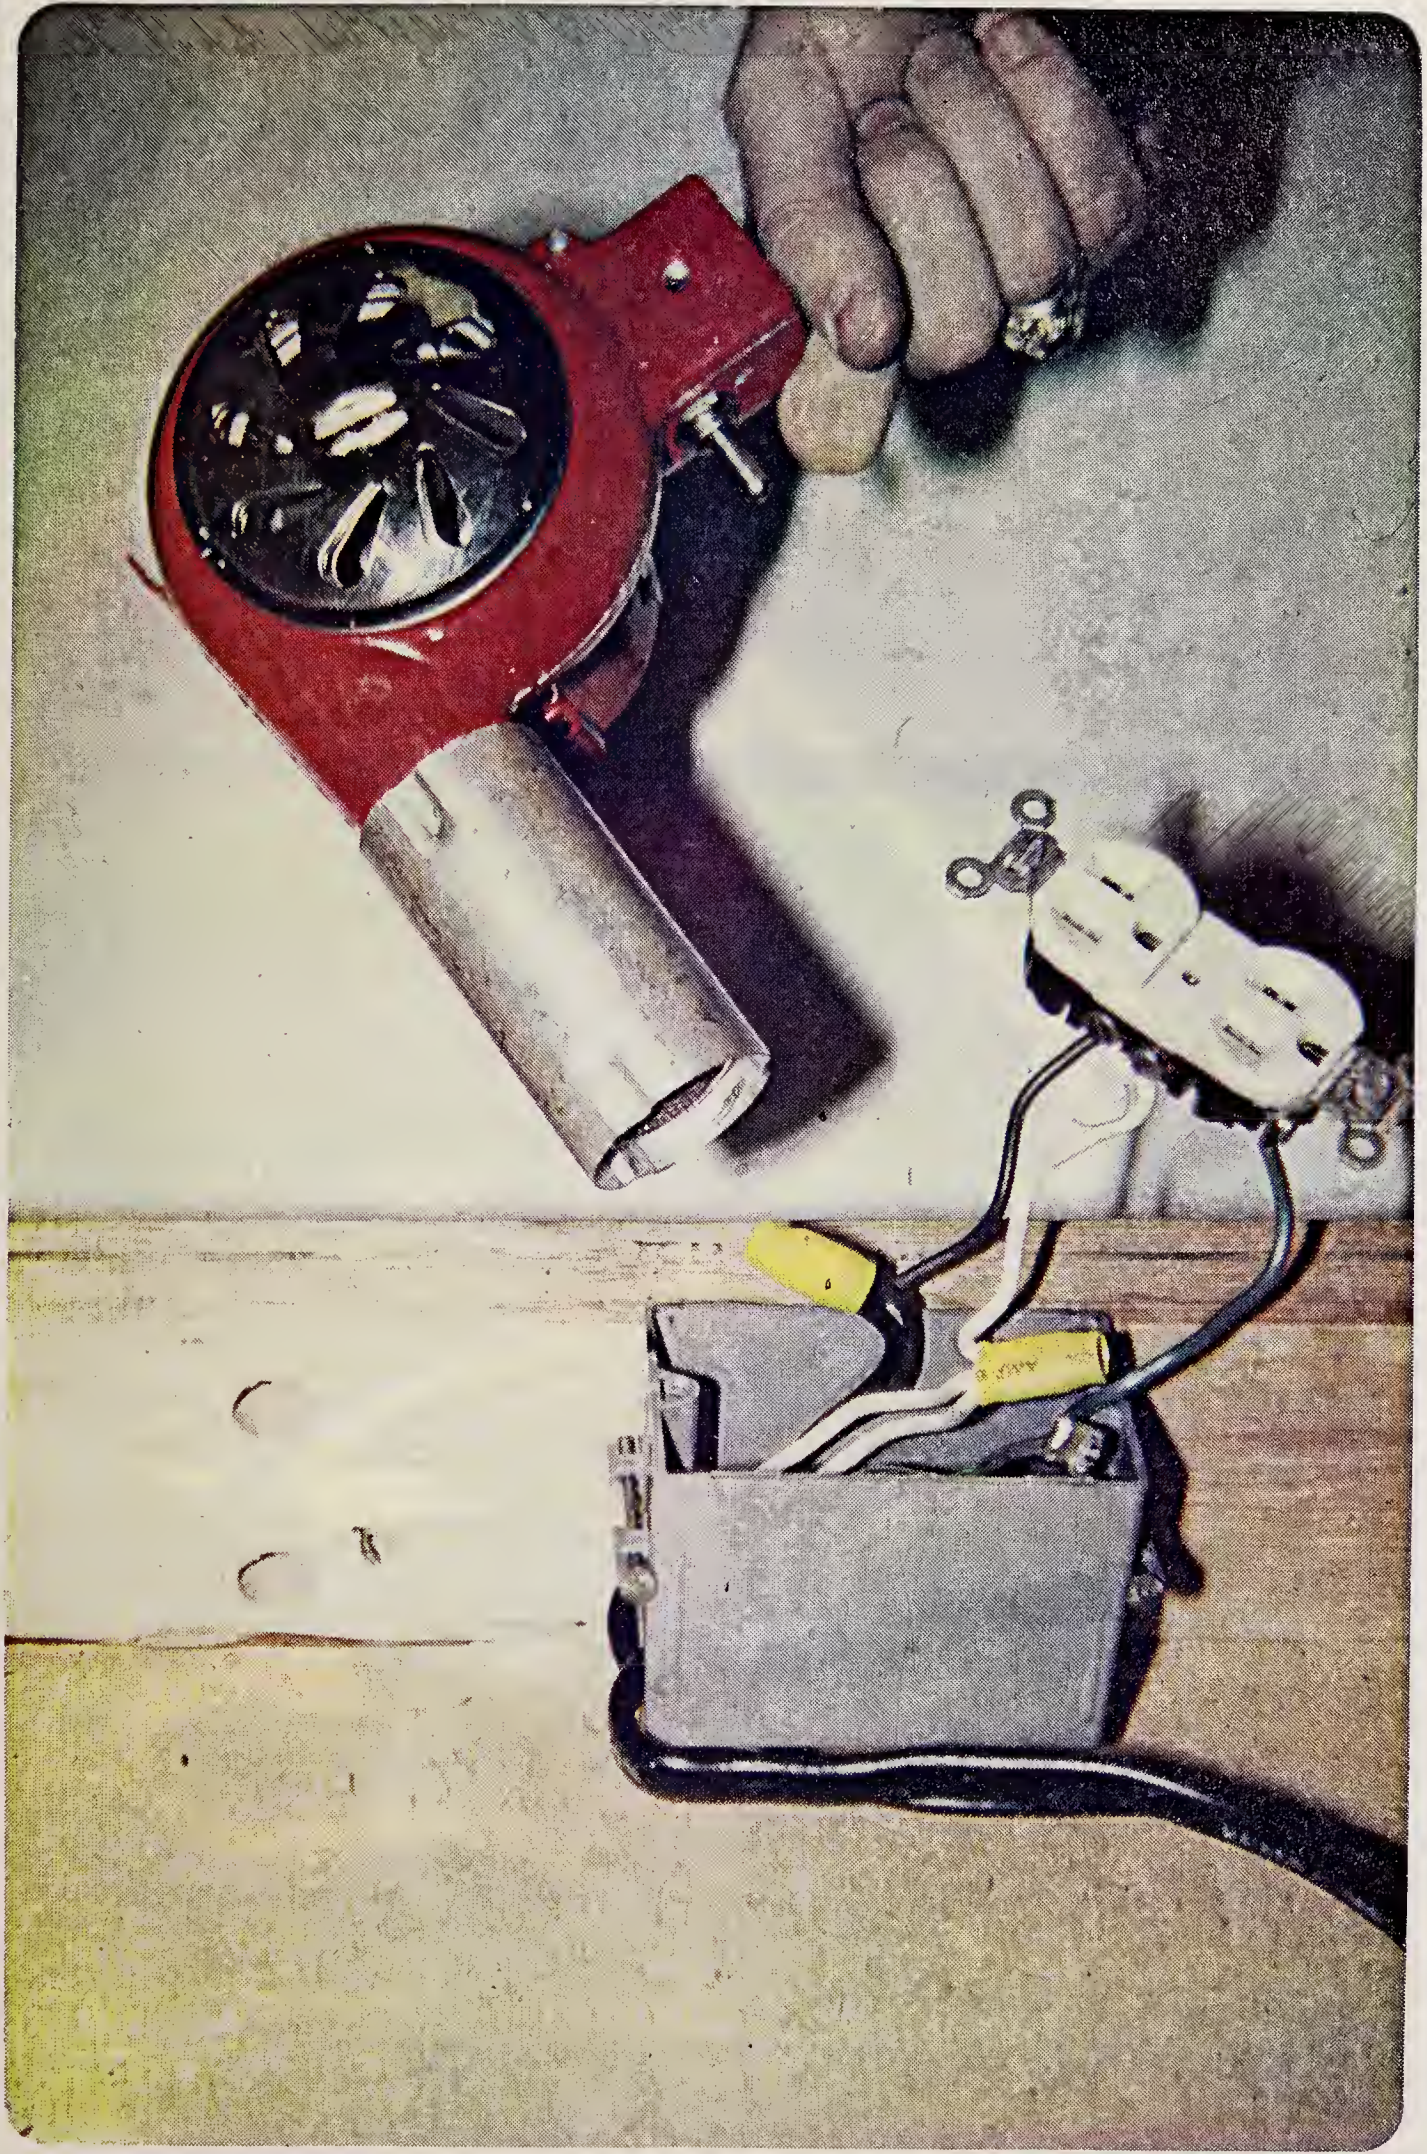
Heat gun is used to shrink insulation sleeve over splice
